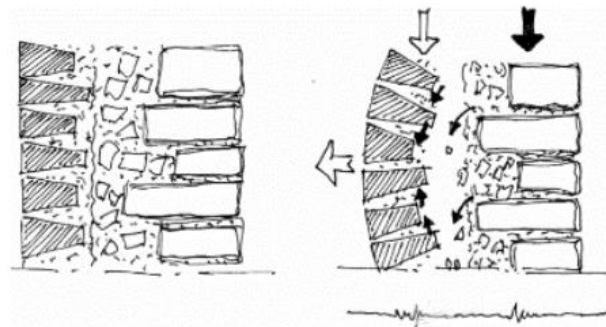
Delamination of multi-wythe wall (Nienhuys, 2003)
